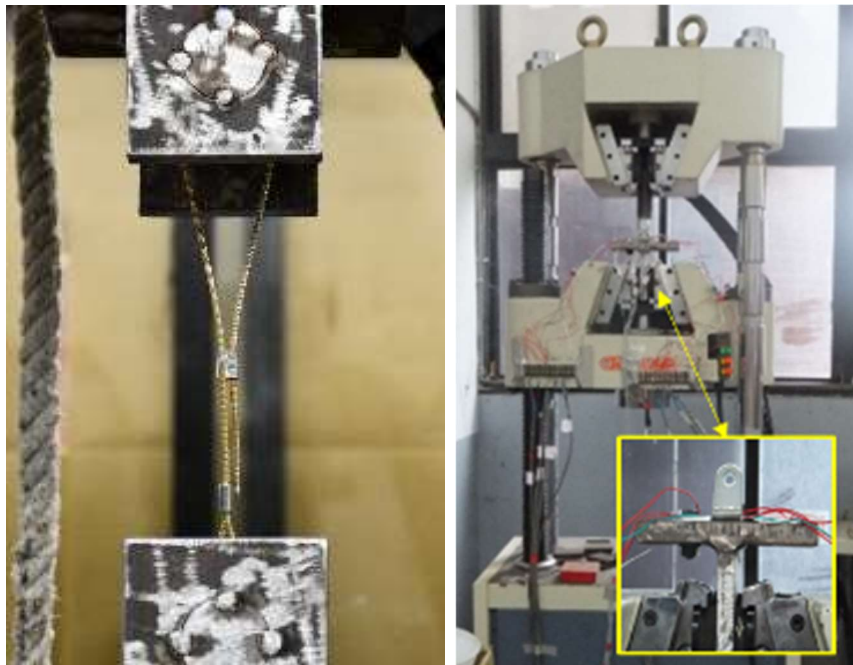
Component tests of steel wire devices (left) and bracing adapter plates (right) for sprinkler piping
